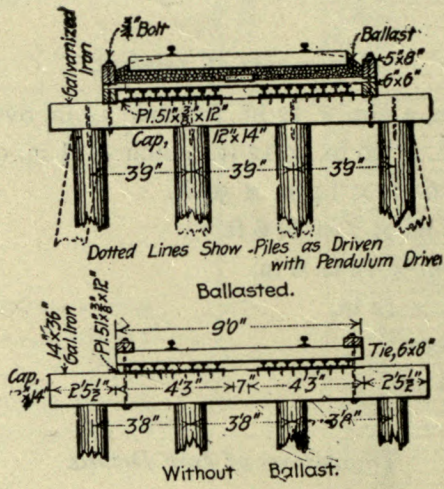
PLATE IXA.—RAIL FLOOR, ATCHISON, TOPEKA & SANTA FÉ RAILWAY.
